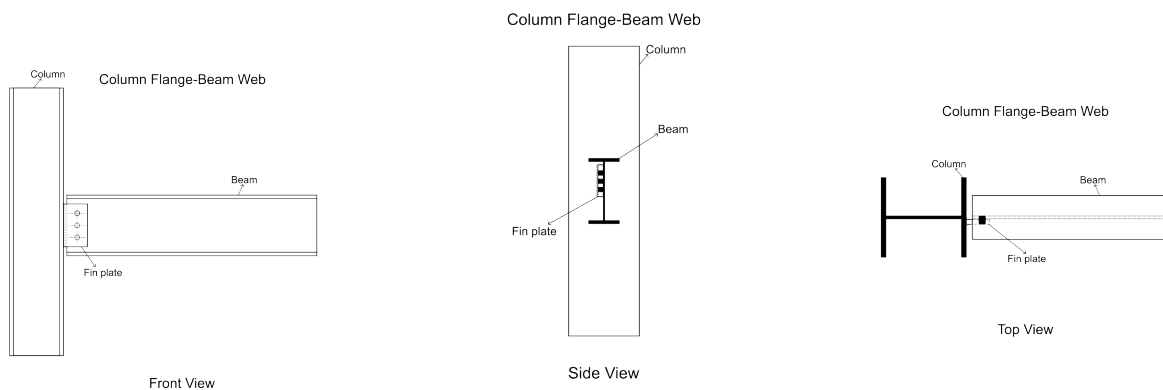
Fin Plate Connection – Column Flange-Beam Web
